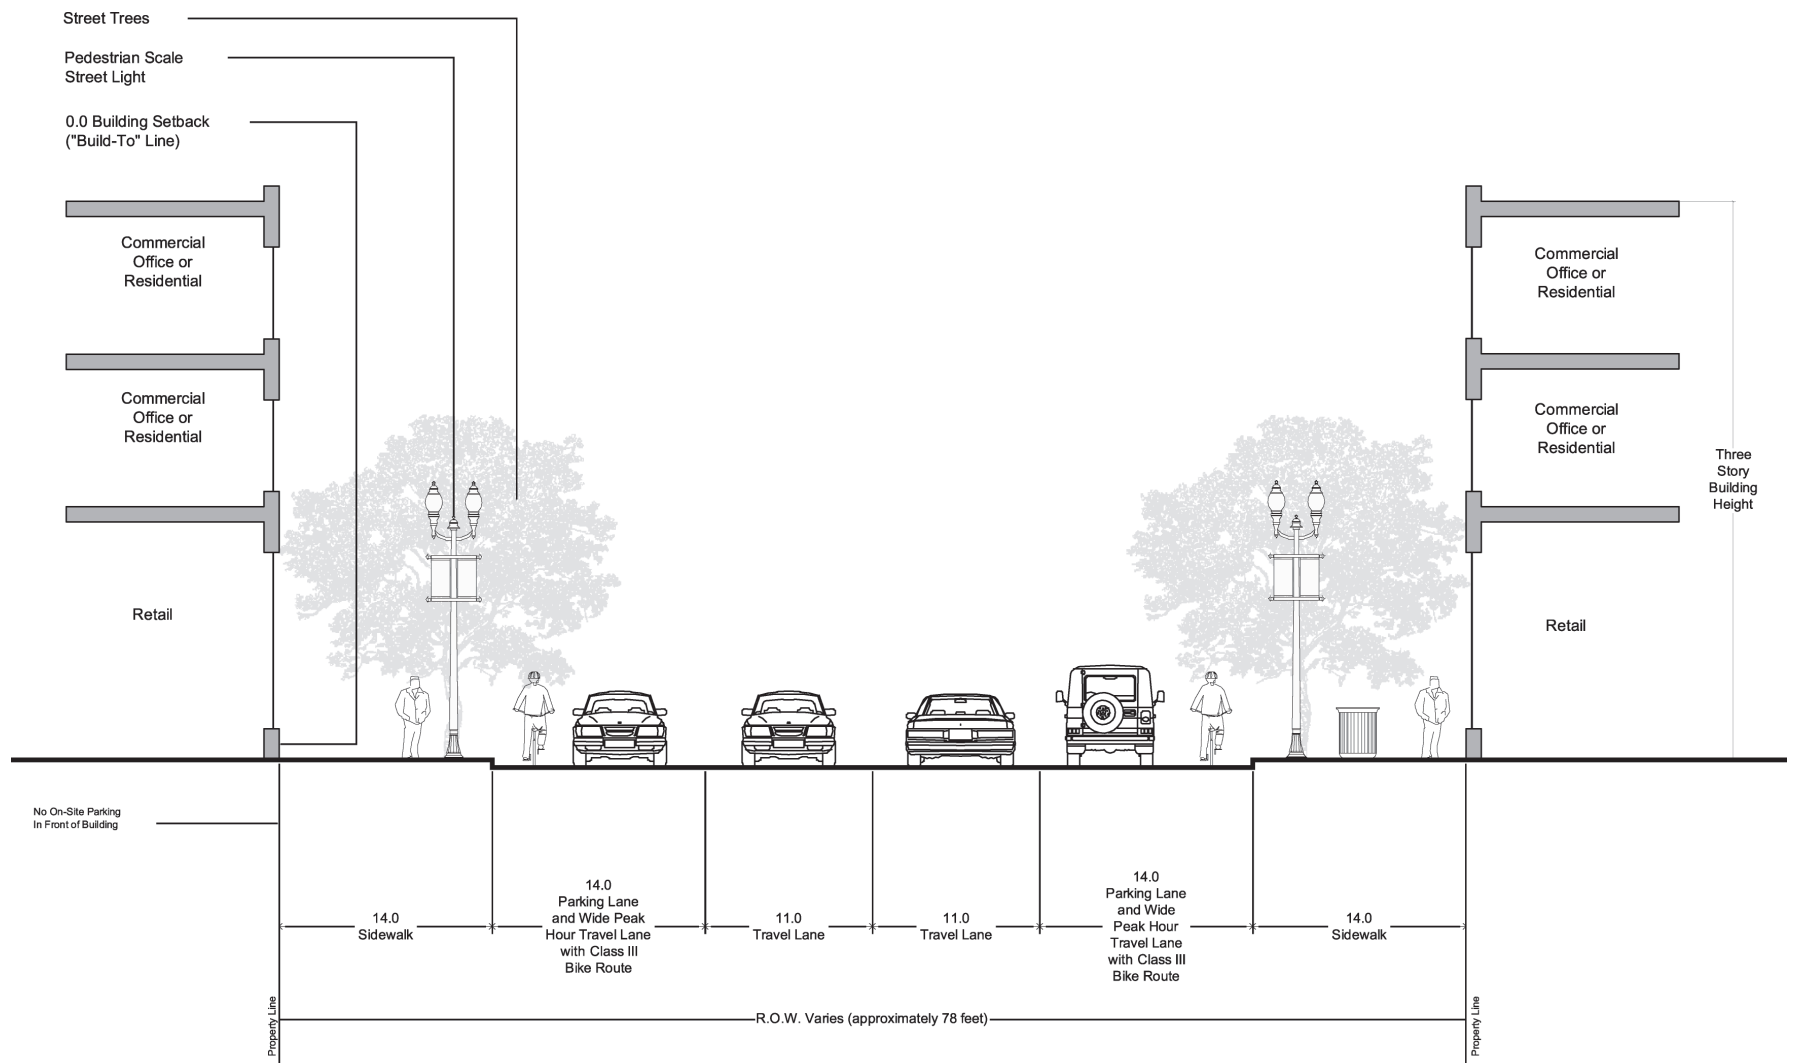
Section B.: Street Character in Village Center Drive, section at Pitt Way, Village Center Drive and Hillcrest Road (2 travel lanes, parking both sides, bike lanes)
